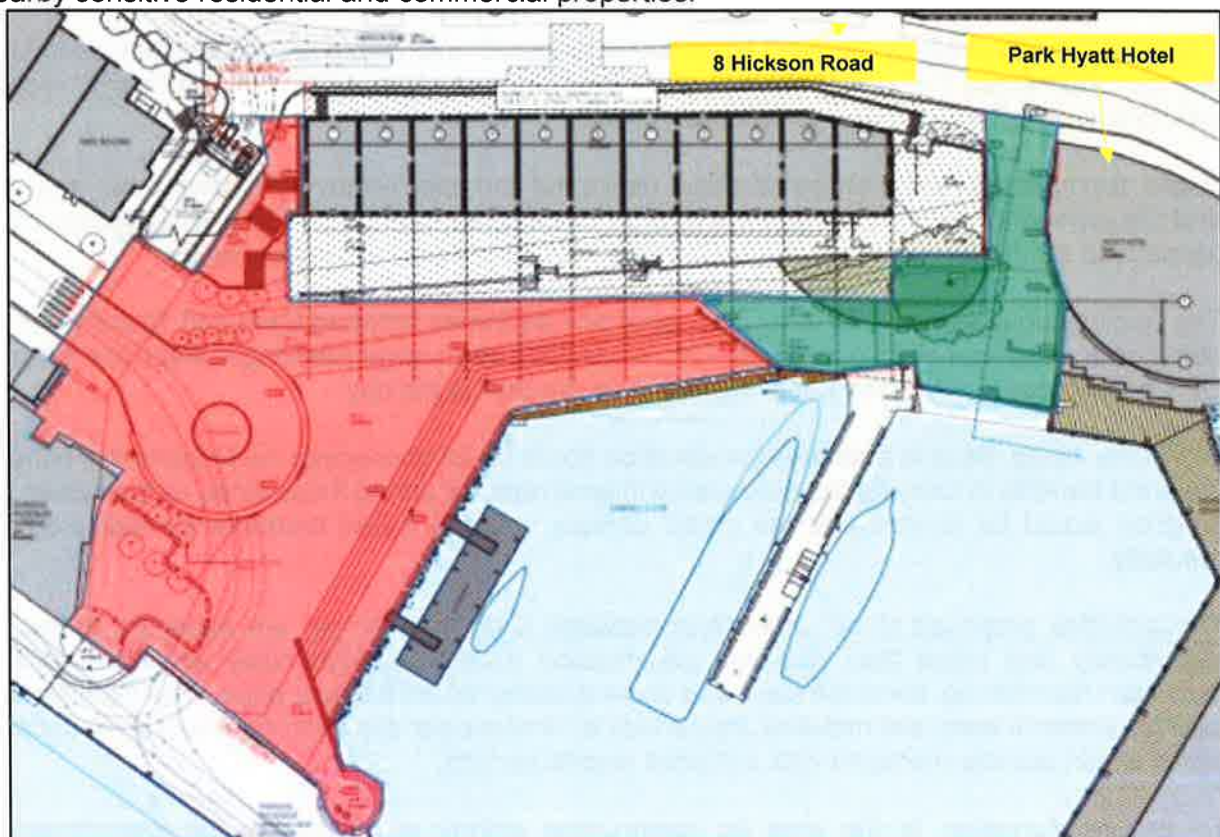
Construction Zones: Green – Zone 1; Red – Zone 2 (Source: Applicant's EIS)
